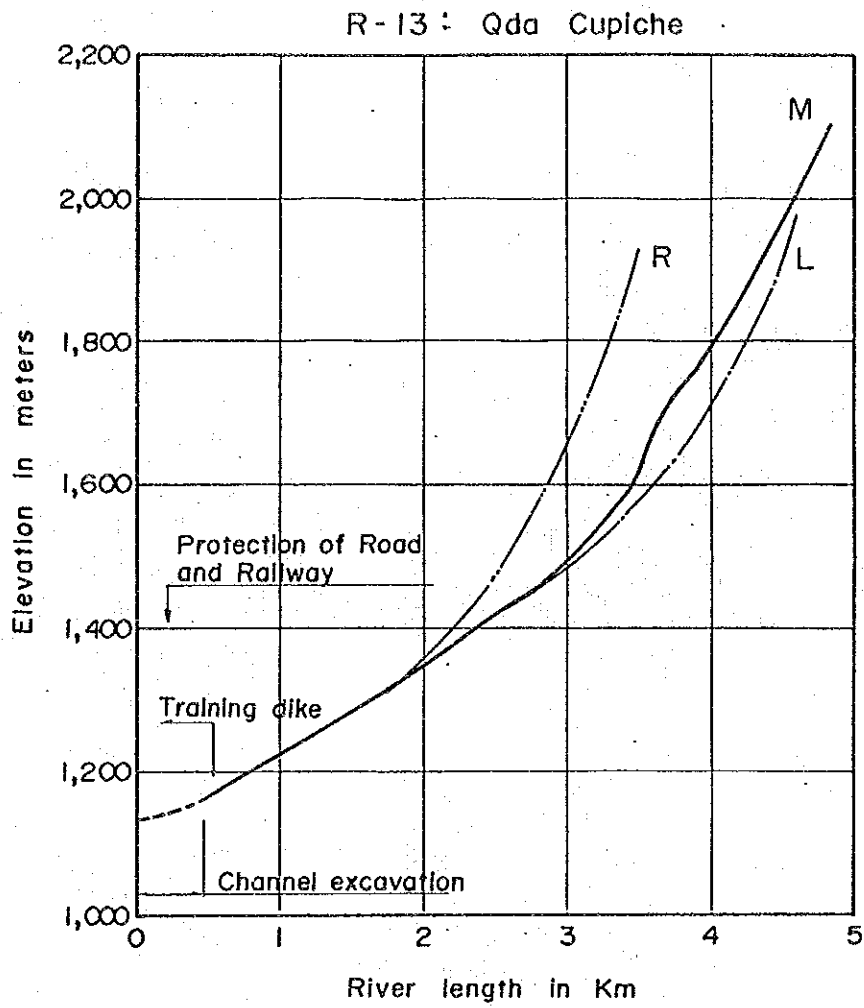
Structural Plan on Profile of Qda Cupiche (R13)
